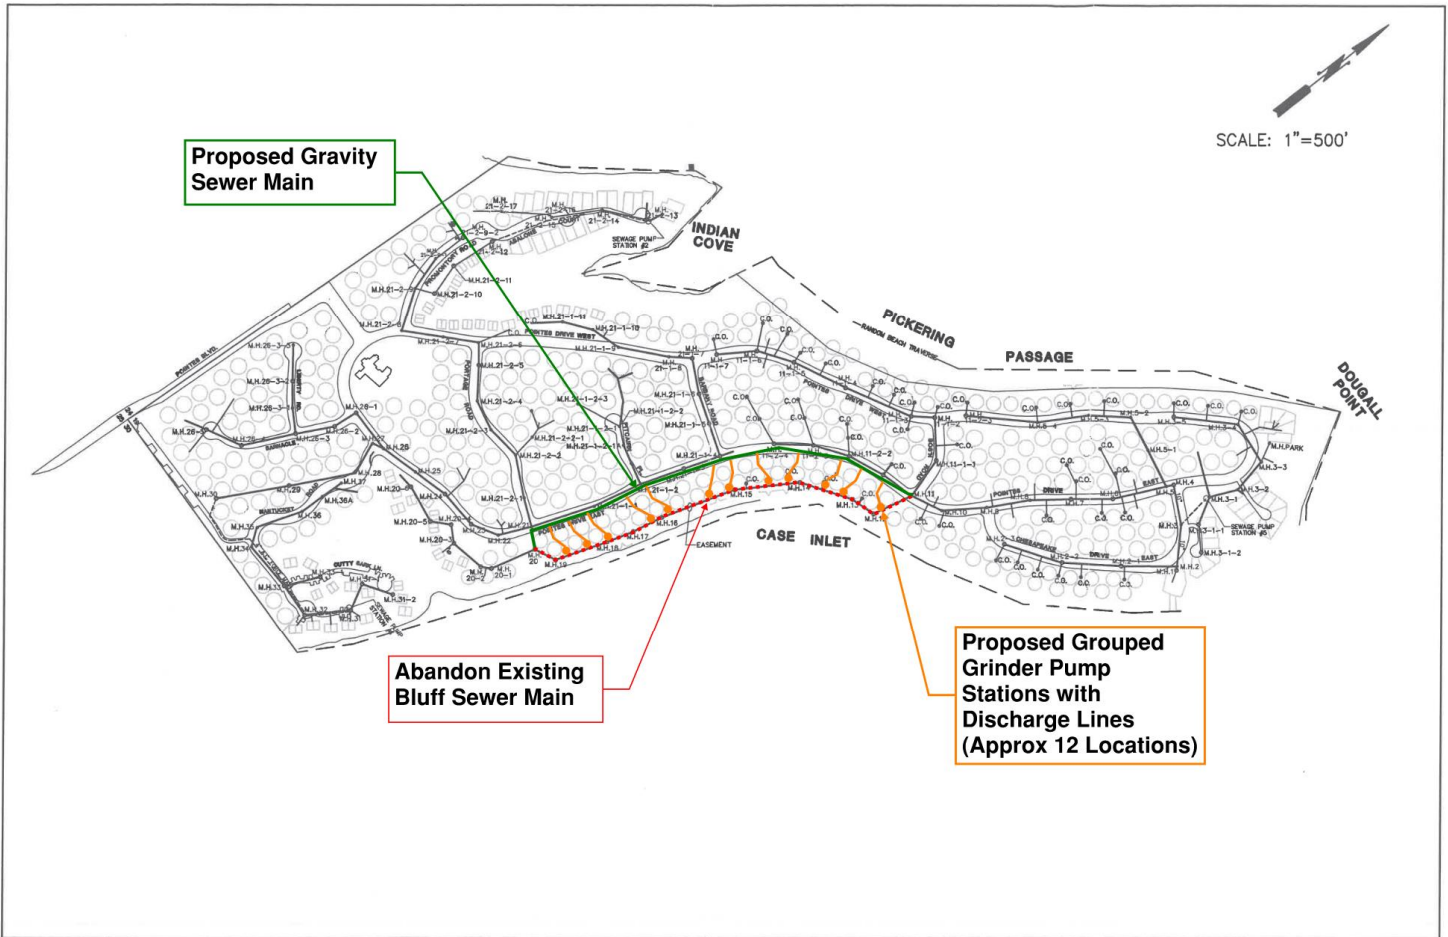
Alternative 3 Gravity Sewer with Grouped Grinder Pumps
